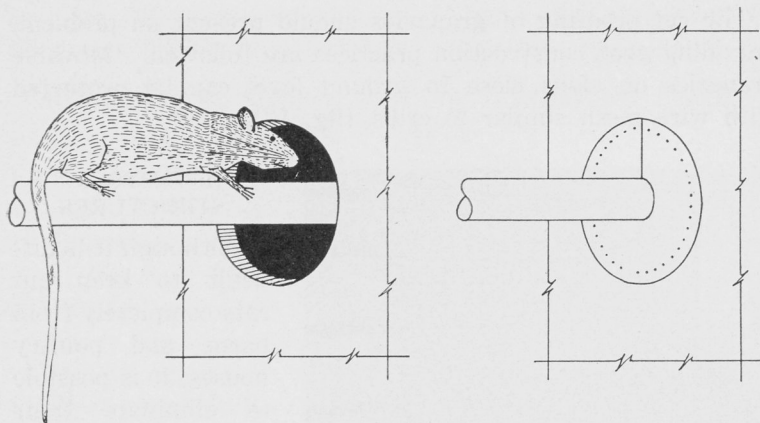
Openings around pipes running through walls should be flashed with sheet metal.
